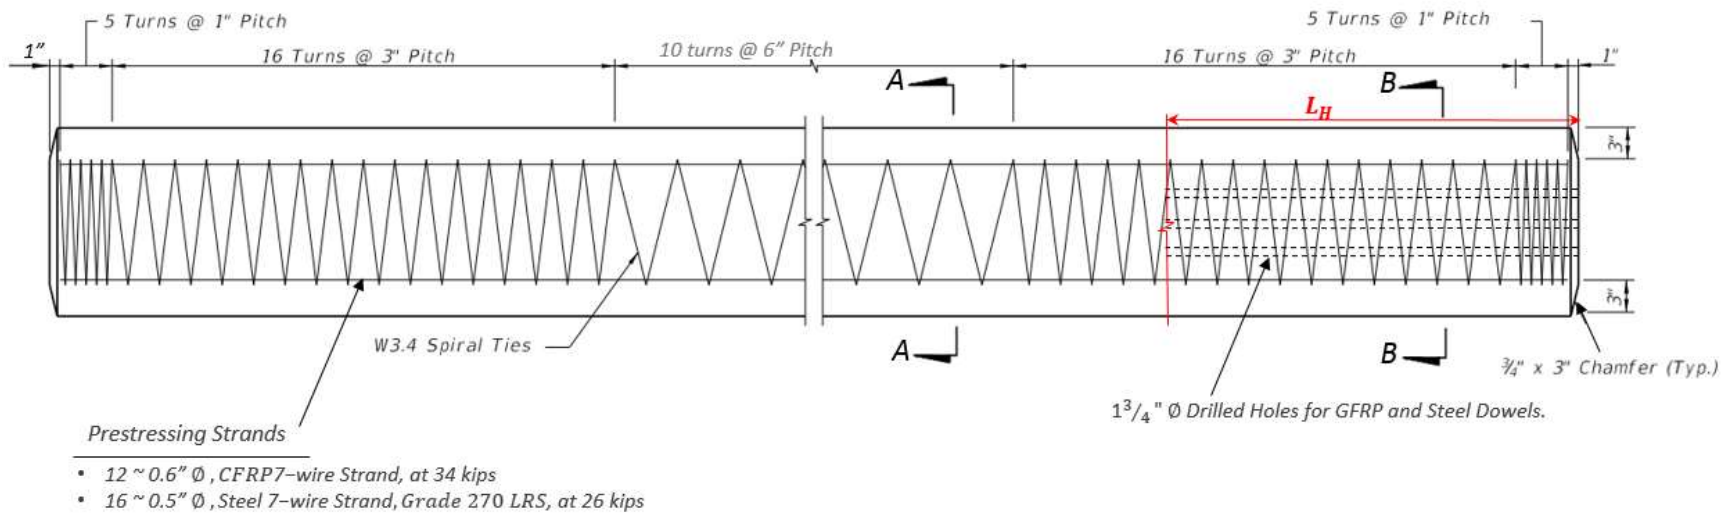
The elevation view of female pile segment (Unforeseen- Specimens 1 and 2)
